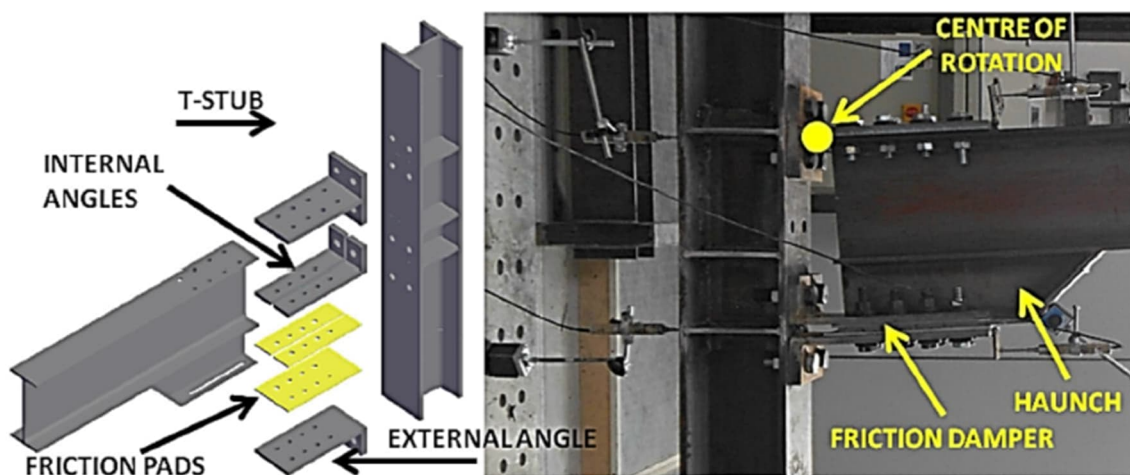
Beam-to-column connection equipped with friction dampers and additional haunch [63]
